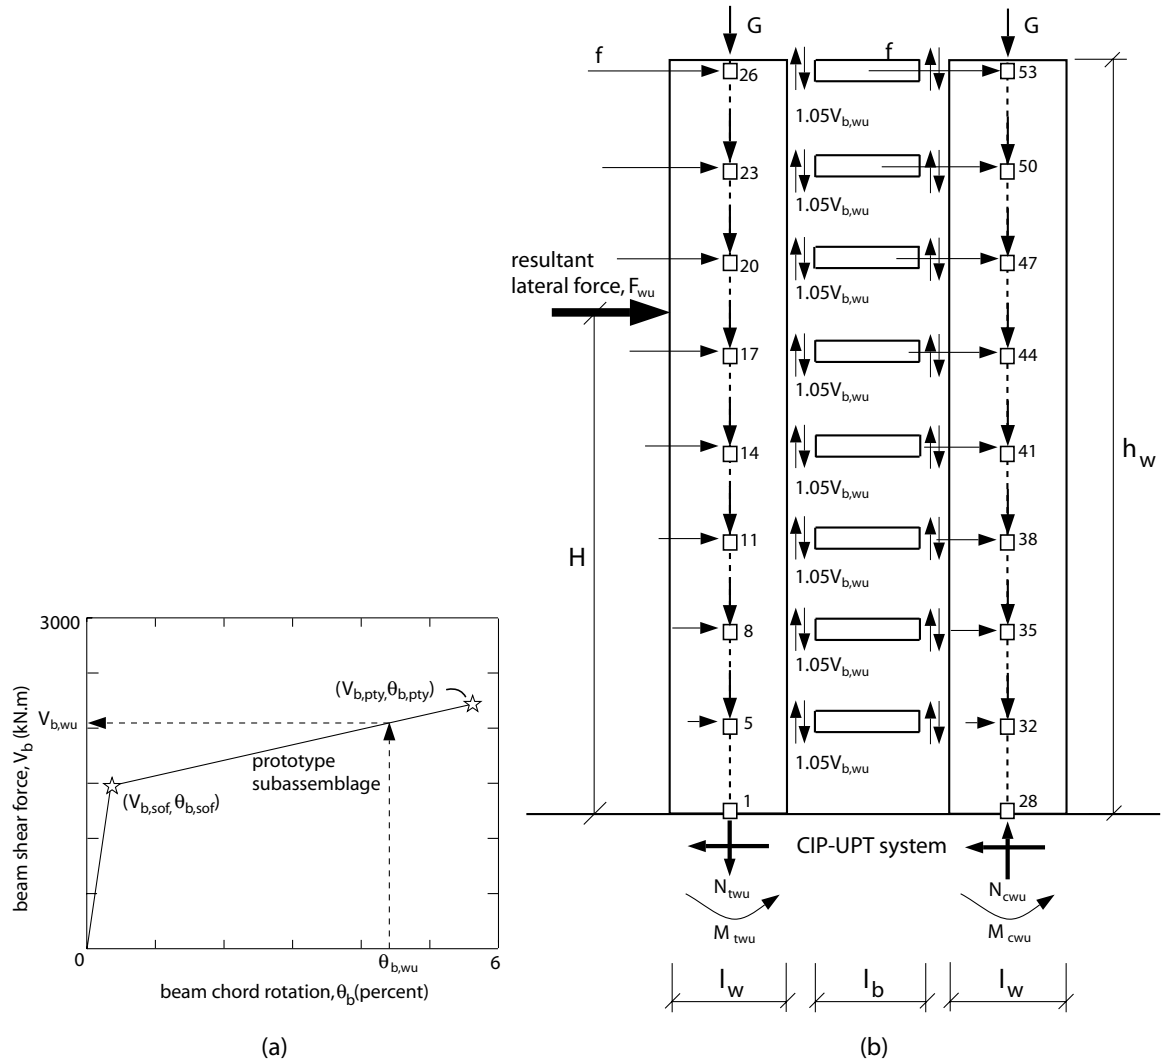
Coupled wall ultimate state for systems with cast-in-place concrete walls:
